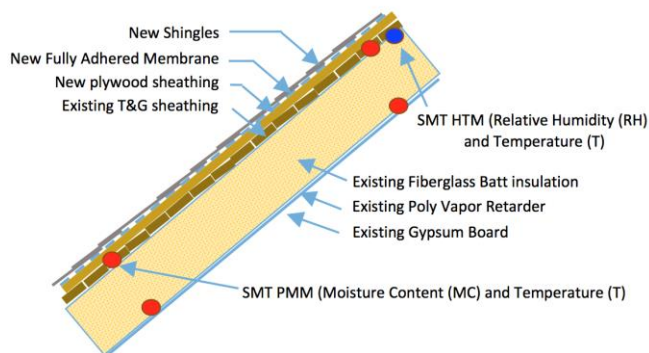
Existing vaulted ceiling assembly remains in Roof Areas 2 & 3
